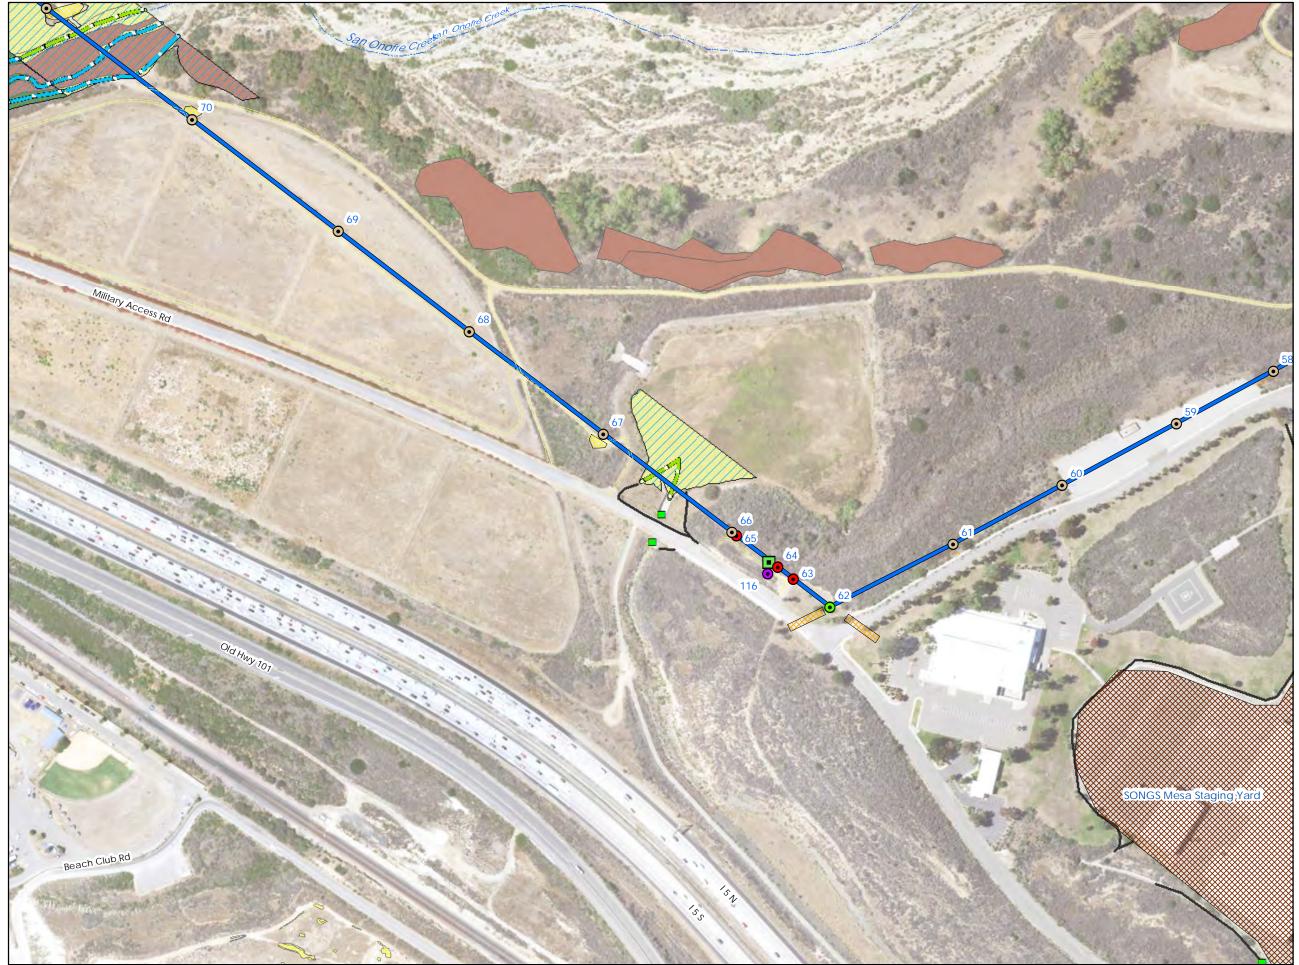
Legend Direct Bury • Overhead Work • Pier Foundation Substation ☐ Guard Structure Existing Access Road Segment D Work / Staging / Turnaround Stringing Site Staging Yard Culvert Concrete V-Ditch/Concrete Channel Erosional Feature (Non-jurisdictional) Swale (Non-jurisdictional)
